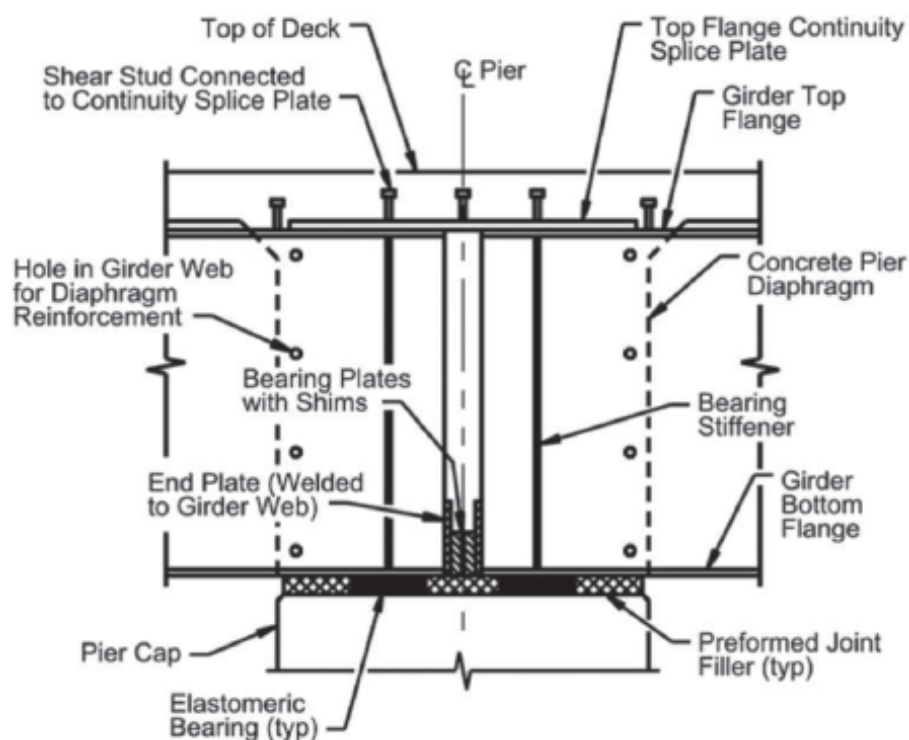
West Virginia Steel Continuity Splice Details [7].
